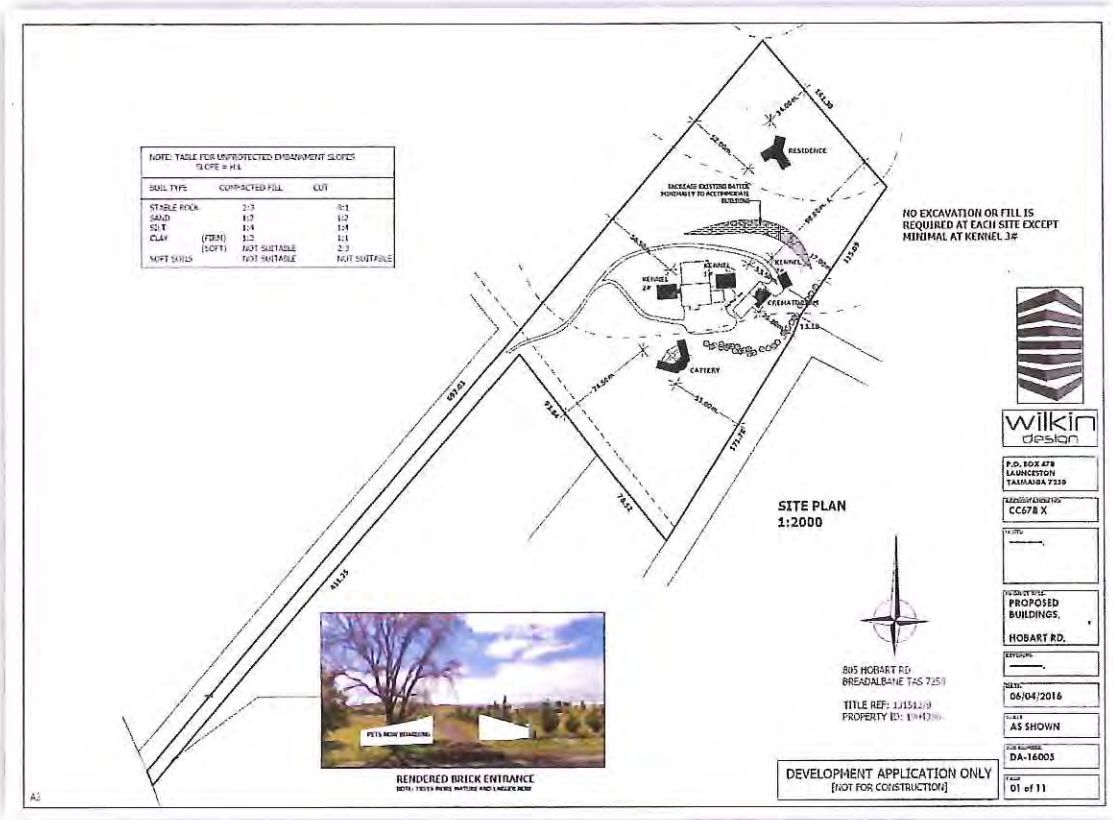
Plan views of the land at 805 Hobart Rd and the dwelling layout.
